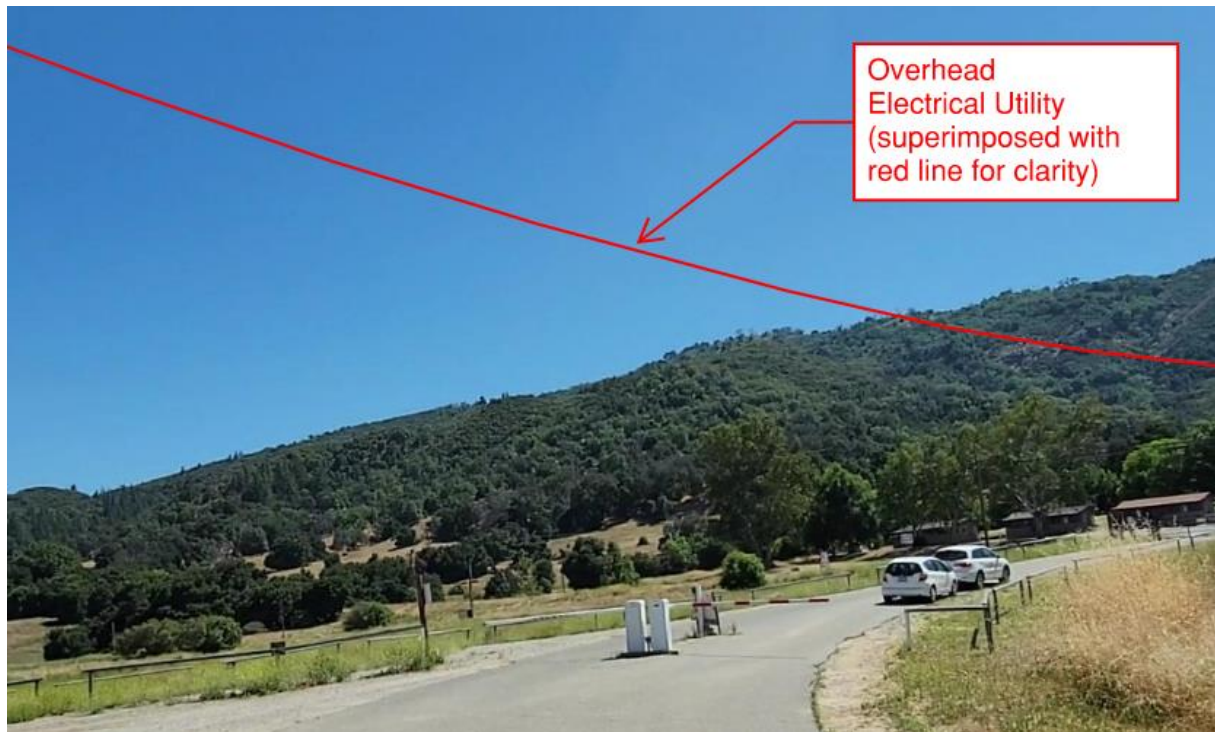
Overhead electrical utility crossing boat ramp access road
